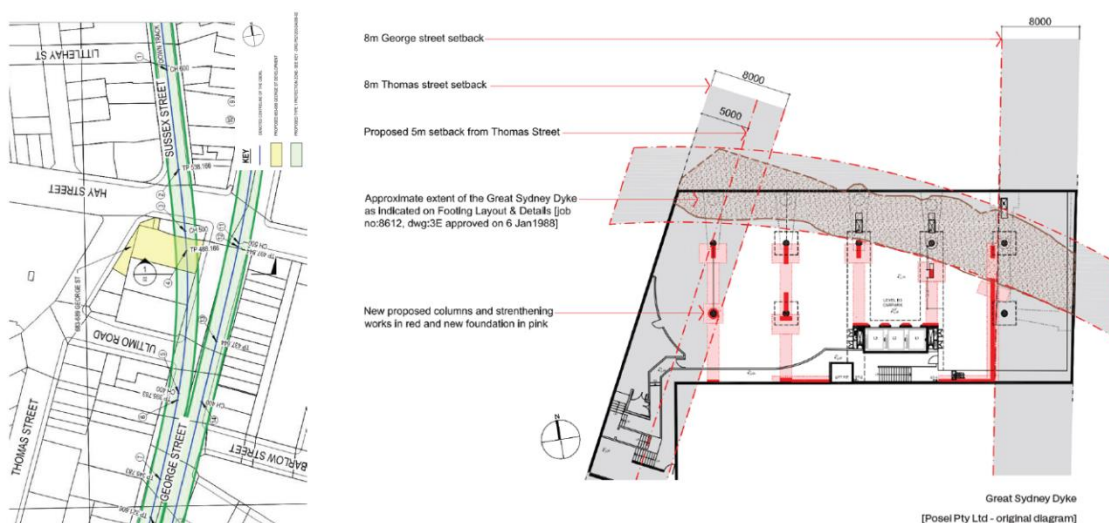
CBD Rail Link zone which runs along the east of the site, as well as the Great Sydney Dyke which is located beneath the site
